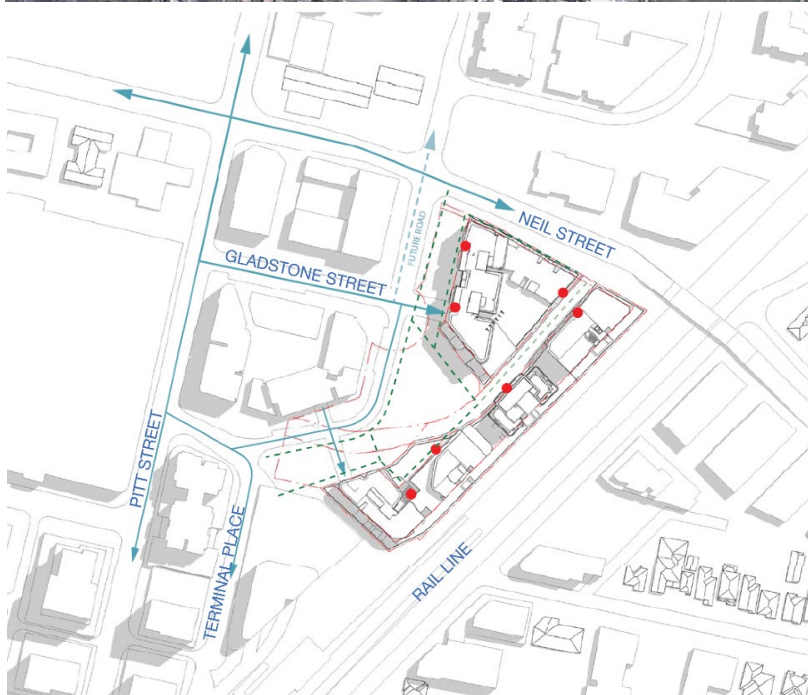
Traffic Diagram with New Road Network (Source: PTW)
